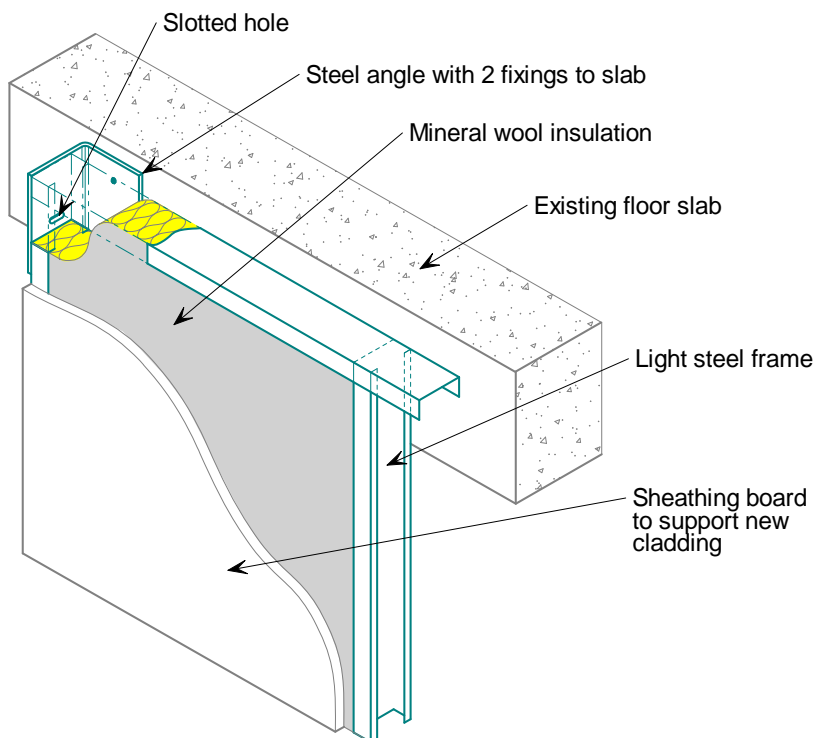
Light steel sub-frame spanning between floors and attached at strong points, such as columns
